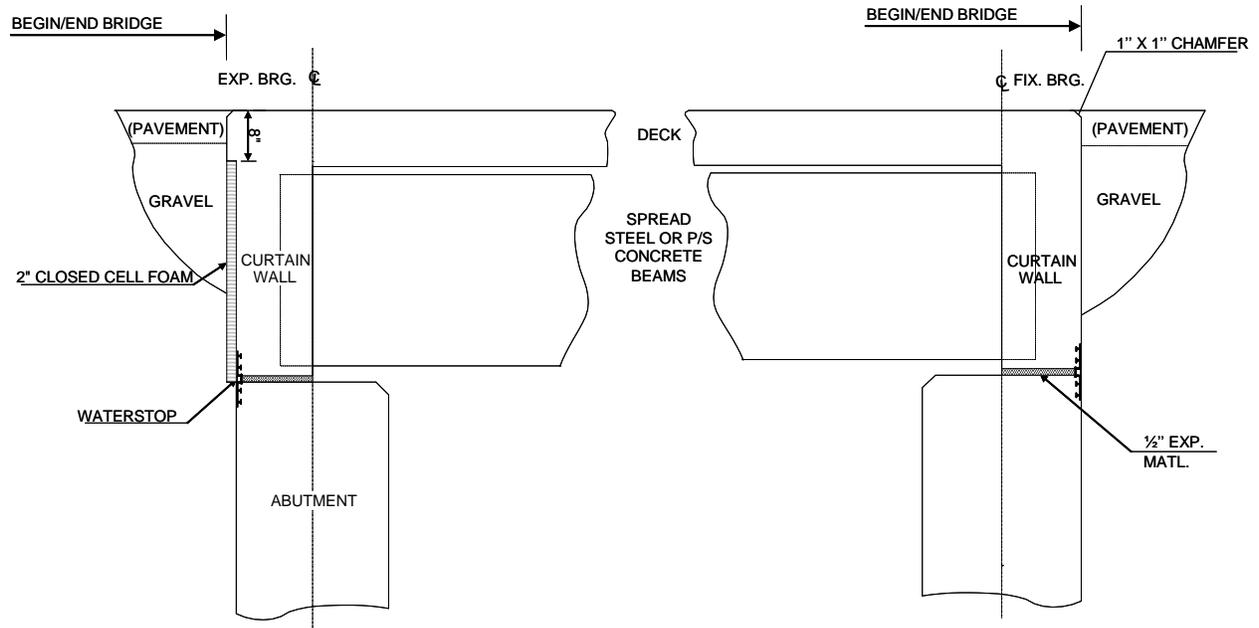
1 Type E – Bridge Ends for intermediate spans without Approach Slabs.
